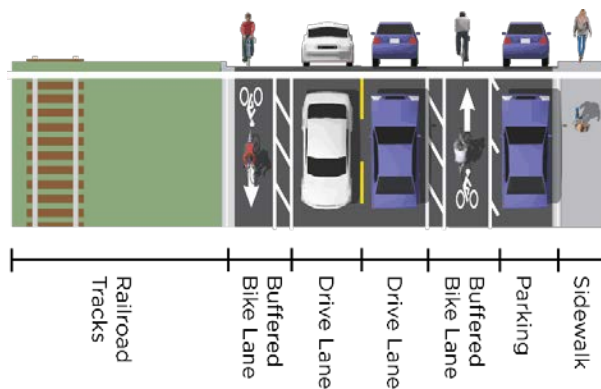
Potential Giant Road Cross Section - Miner Ave to Brookside Dr
